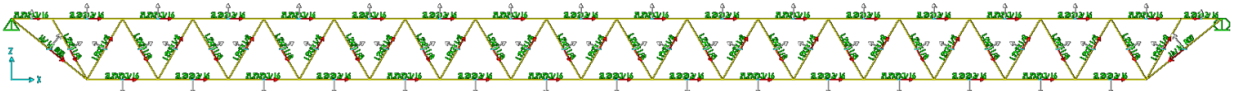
Constructed open-web steel joist in SAP2000.
